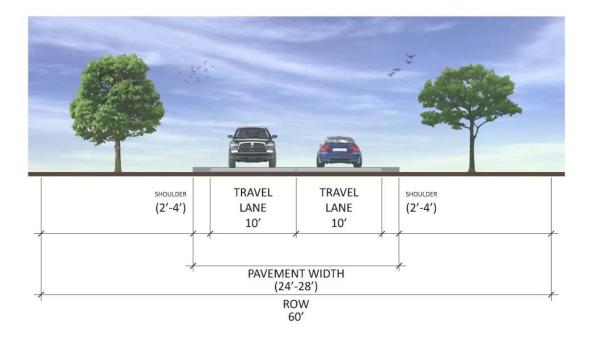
Recommended Rural Local Street Cross-Section
